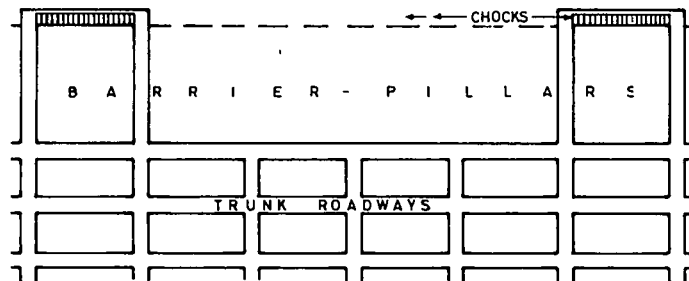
a. Heading development through Barrier-pillar and installation of supports.
